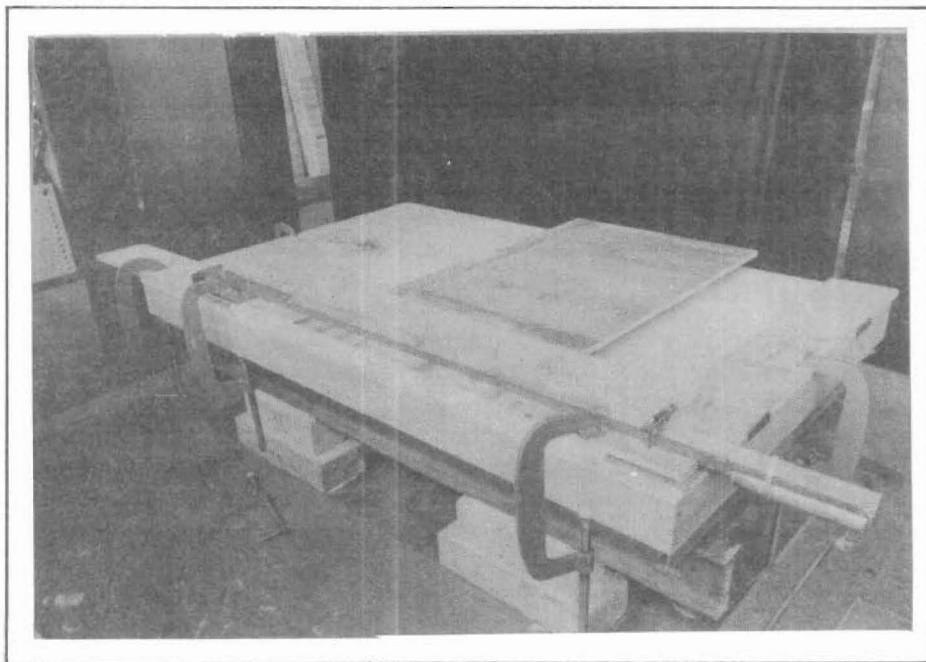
Single clamp used on the top and bottom layers of an M_2 element.
